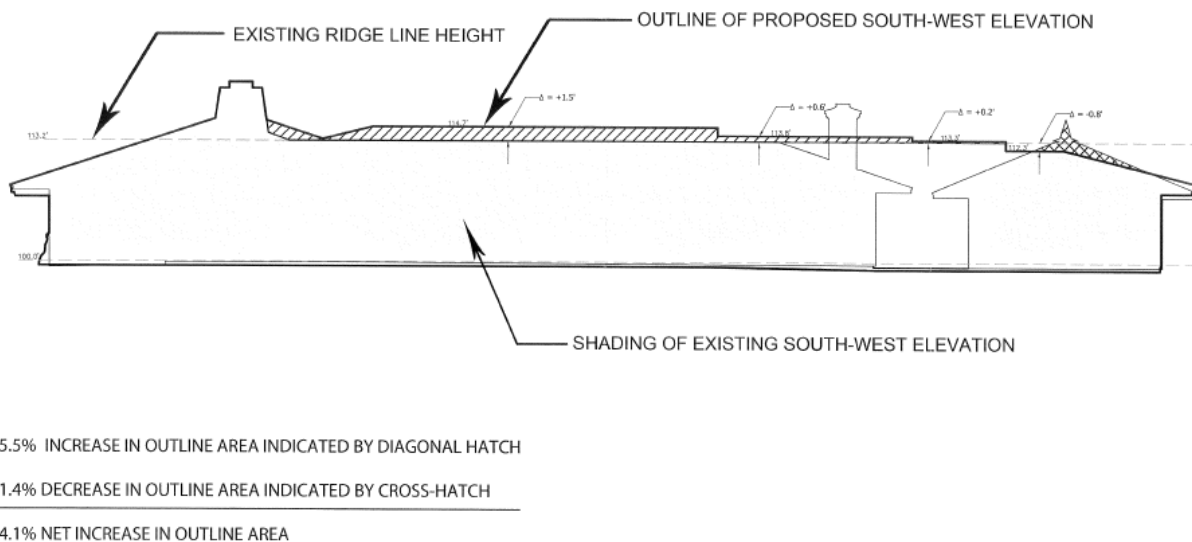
Southwest Elevation Silhouette (Source: IX.23)
